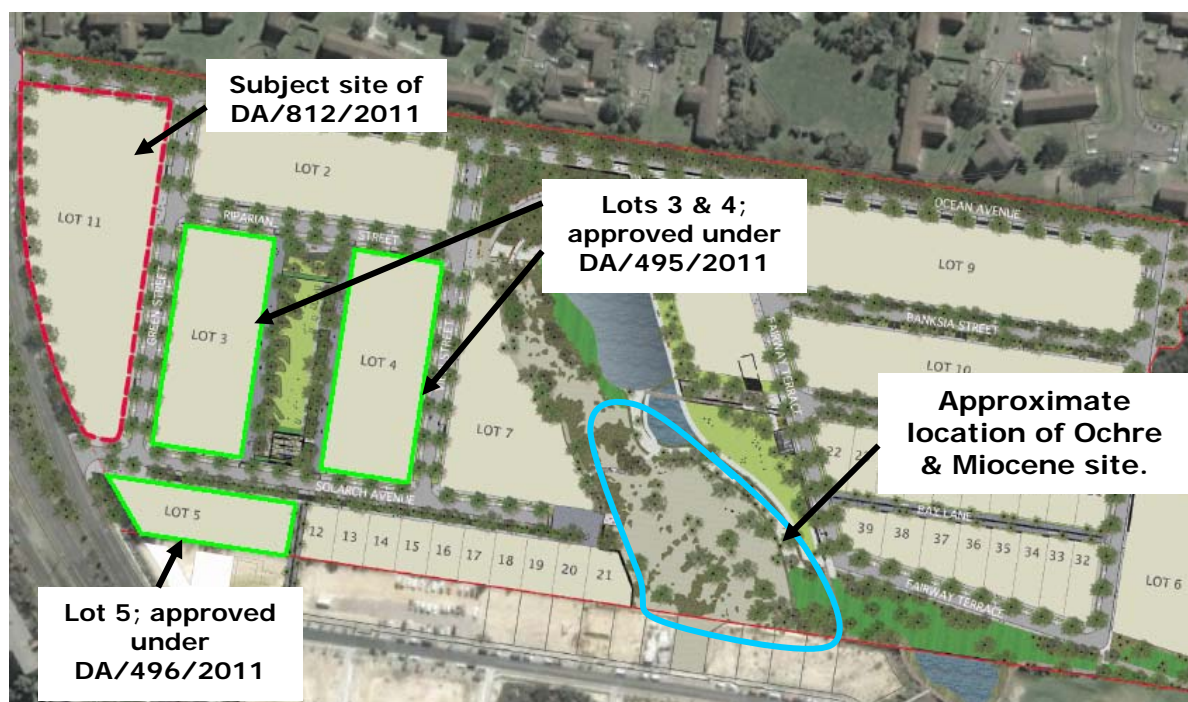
Approved Stage 1 subdivision plan of 1408 Anzac Parade per DA/81/2009. Subject site bound in red. Past Stage 2 approvals highlighted in green. Aboriginal Heritage site in blue.
